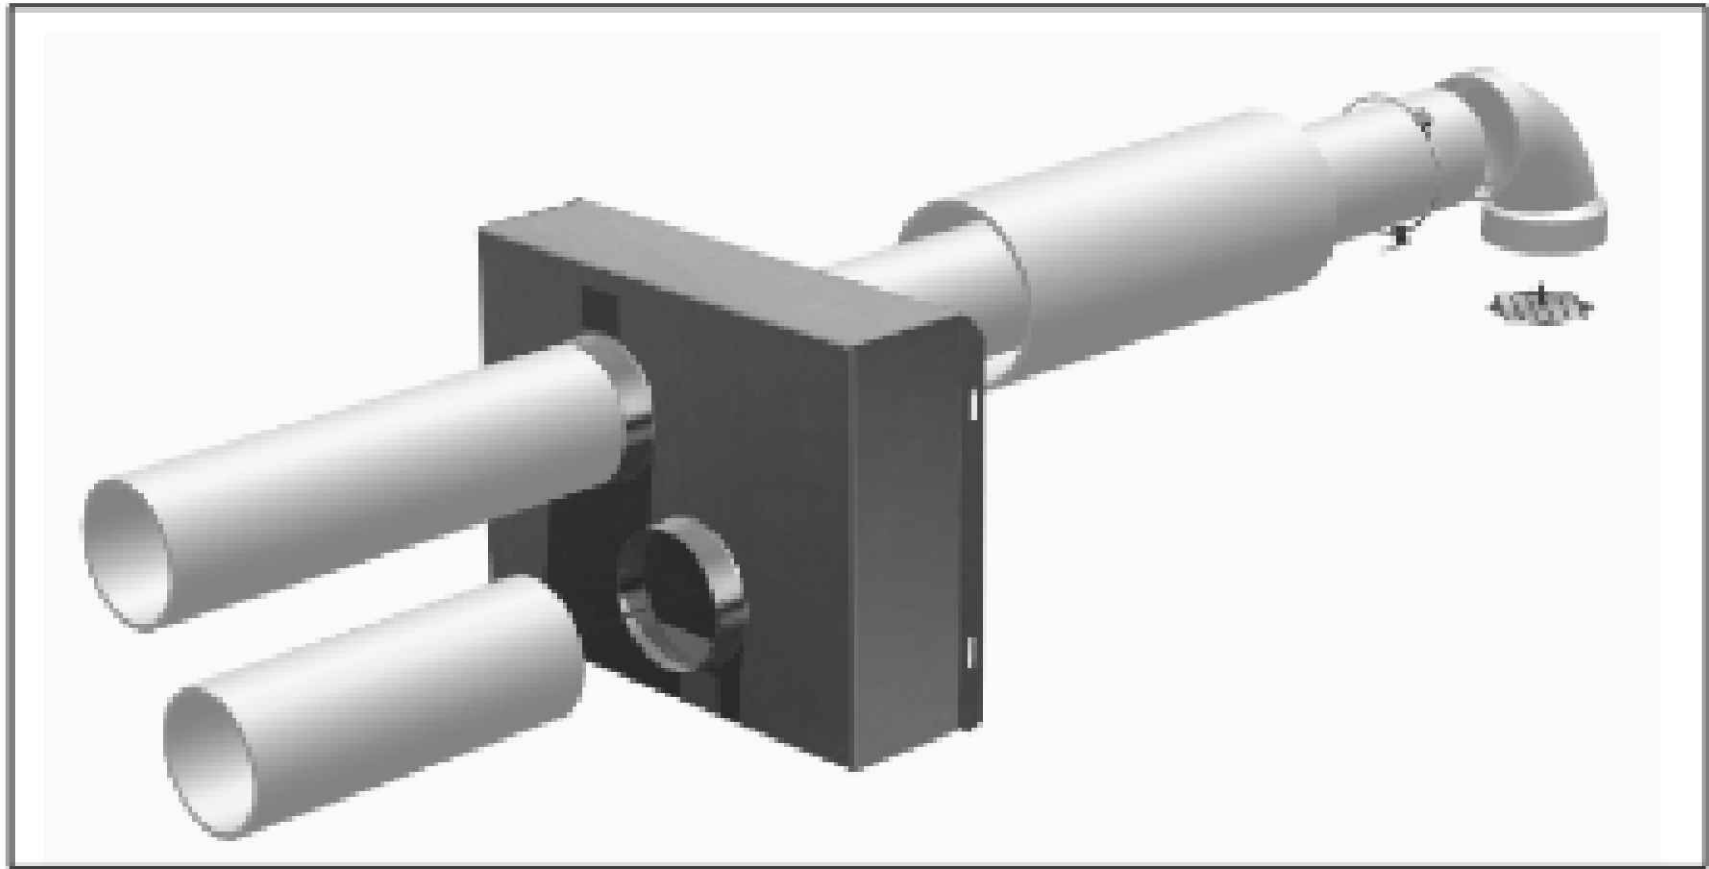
Adapter Box with Combustion Air Intake Pipe Attached
